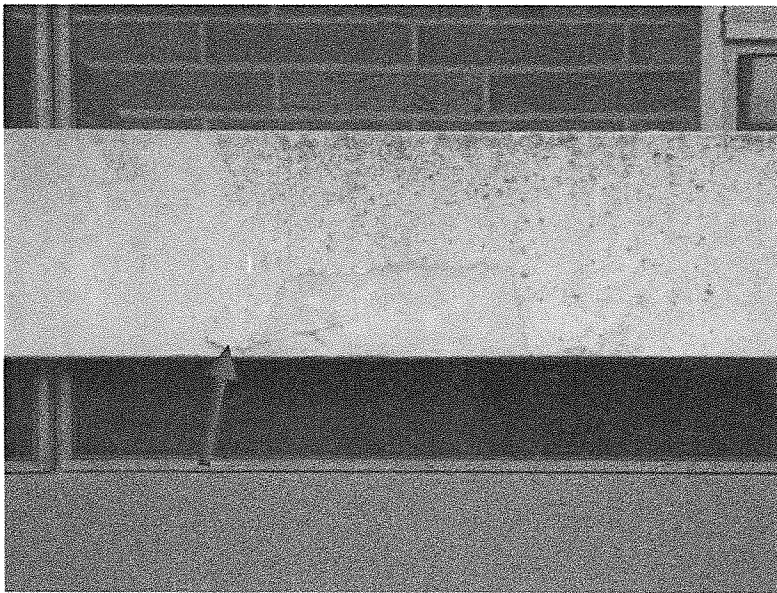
Incipient spall on balcony rail at west facade, third floor
